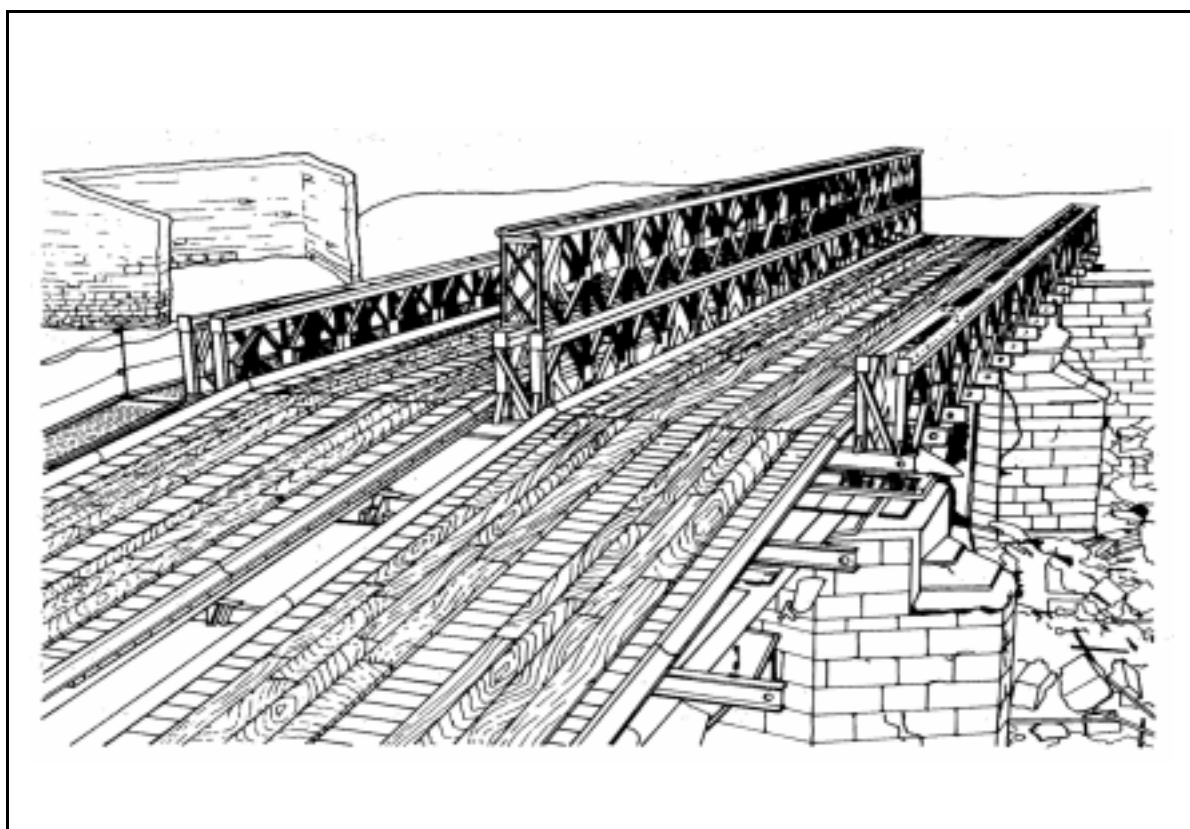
Bailey Panels Over a Demolished Masonry Arch
